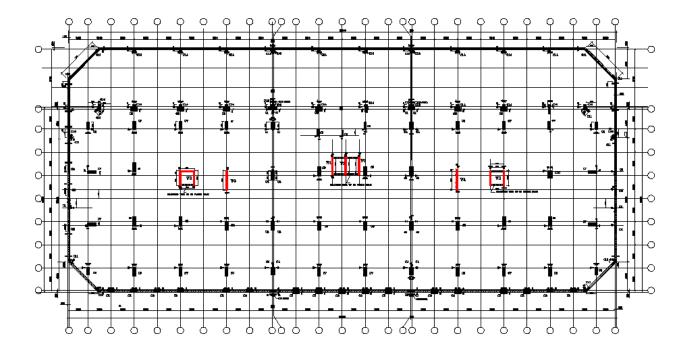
Location of shear walls in the building (shear walls highlighted in red)
